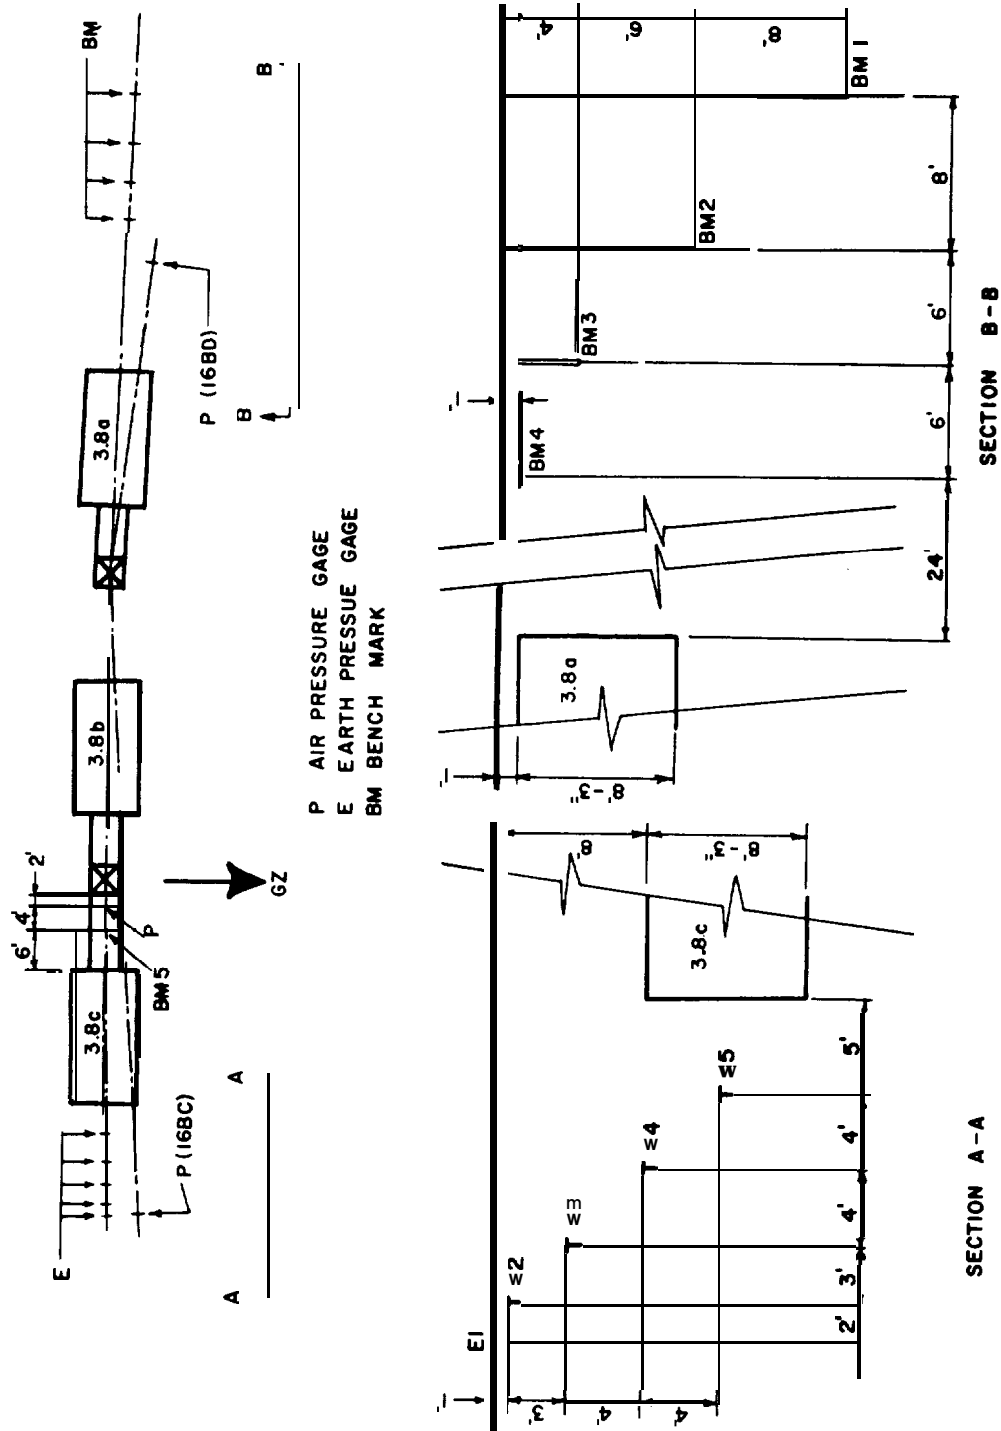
Location of Earth Pressure Gages and Bench Marks
